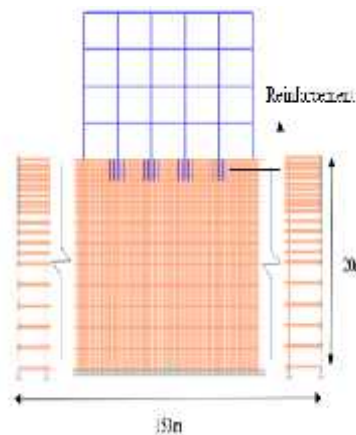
Front view of Space frame resting on reinforced soil (reinforcement below internal footings only).
